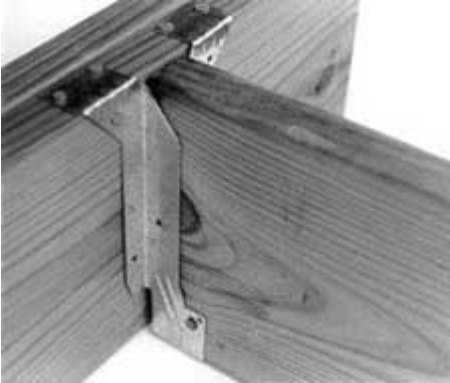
Supporting joists with truss hangers helps keep a boardwalk closer to the ground.
